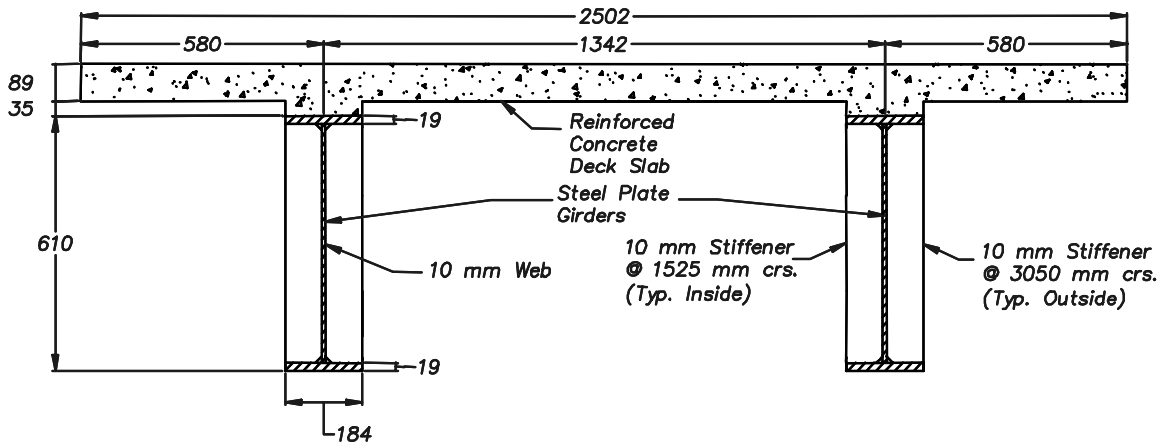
Steel plate girder bridge model - girder and deck slab dimensions
